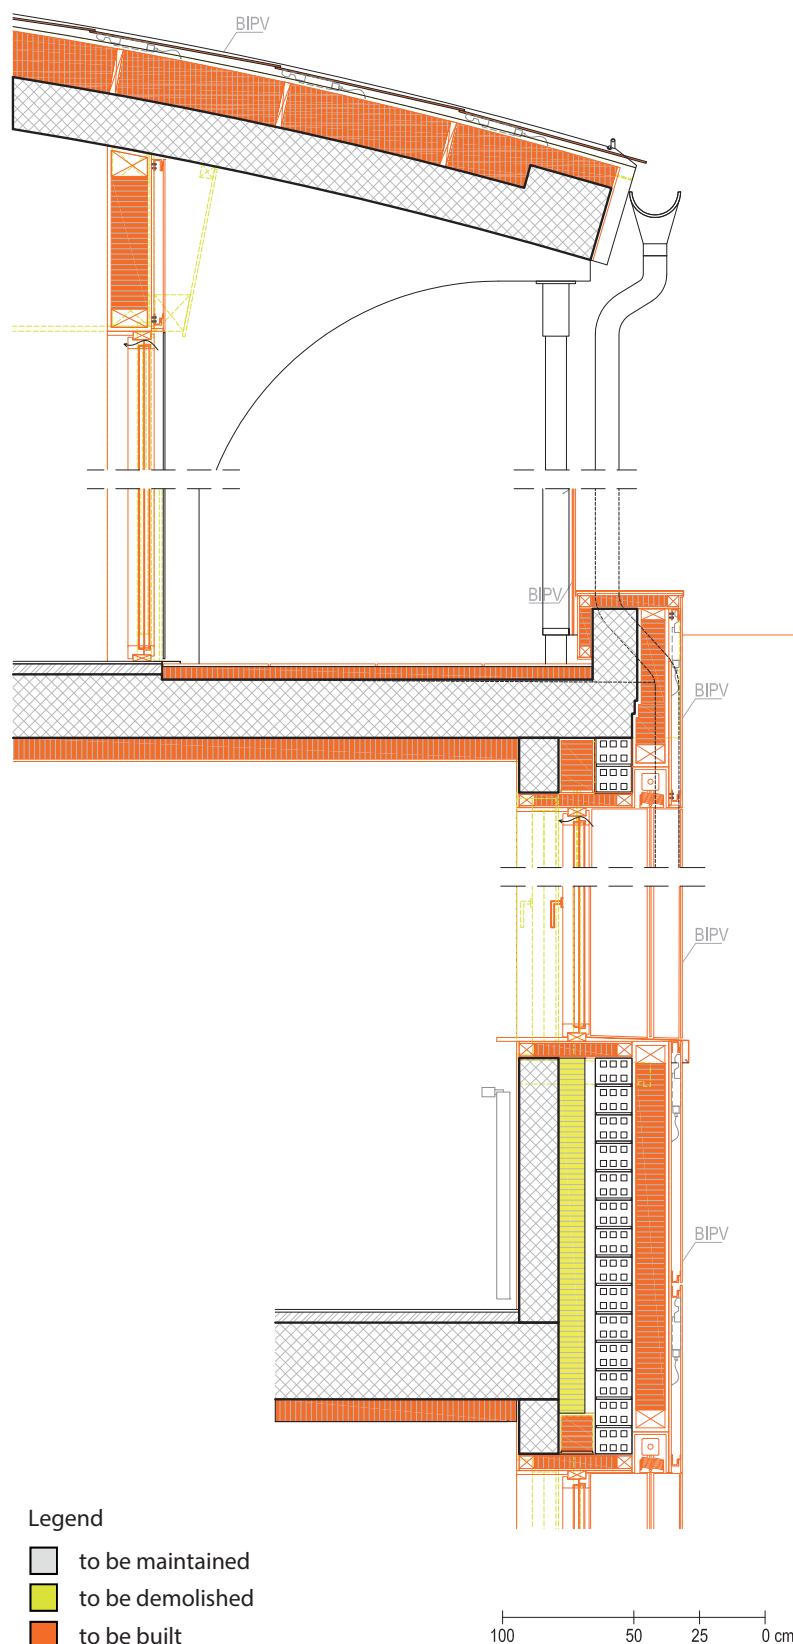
Façade constructive detail, S3-Transformation, Archetype 5.
